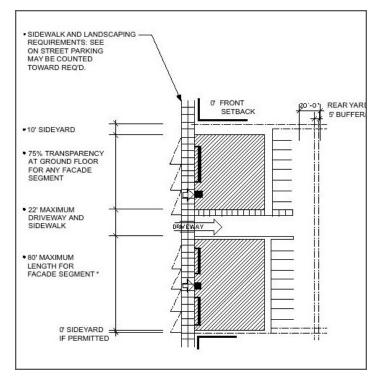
Site plan for intermediate infill site with long frontage and two separate structures.
